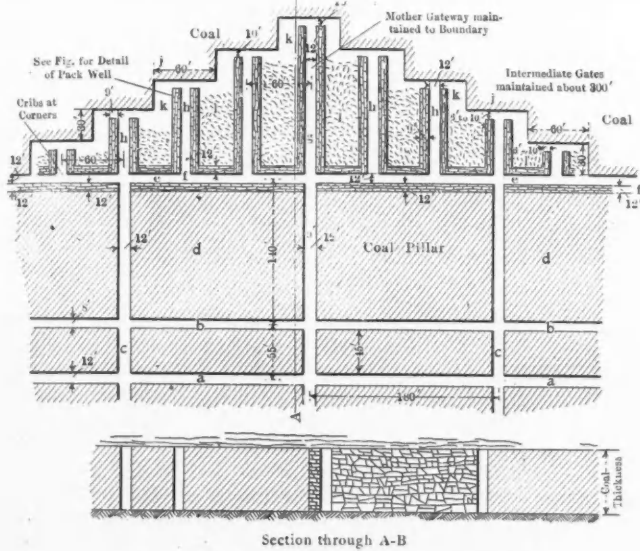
LONGWALL PLAN OF MINING SHOWING MAIN GATEWAY
